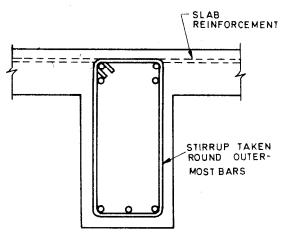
Shear and Torsional Reinforcement in Flanged Beams
